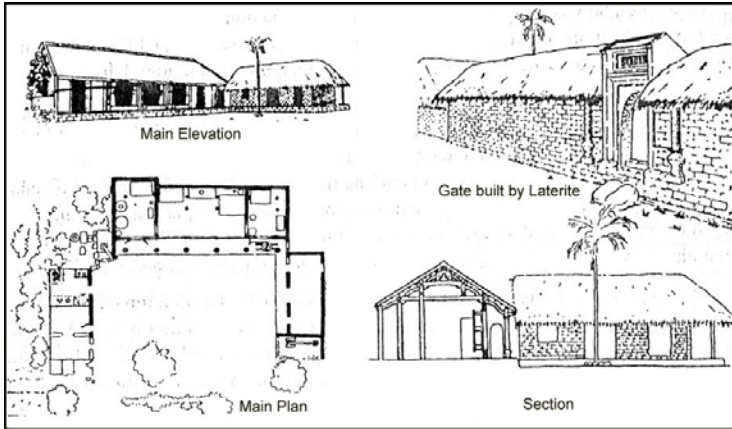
b.2: Typical house plan in North Vietnam. Source: <http://dalatarchi-trchoa.blogspot.com/2012/12/ac-trung-kien-truc-nha-vuon-truyen.html>
